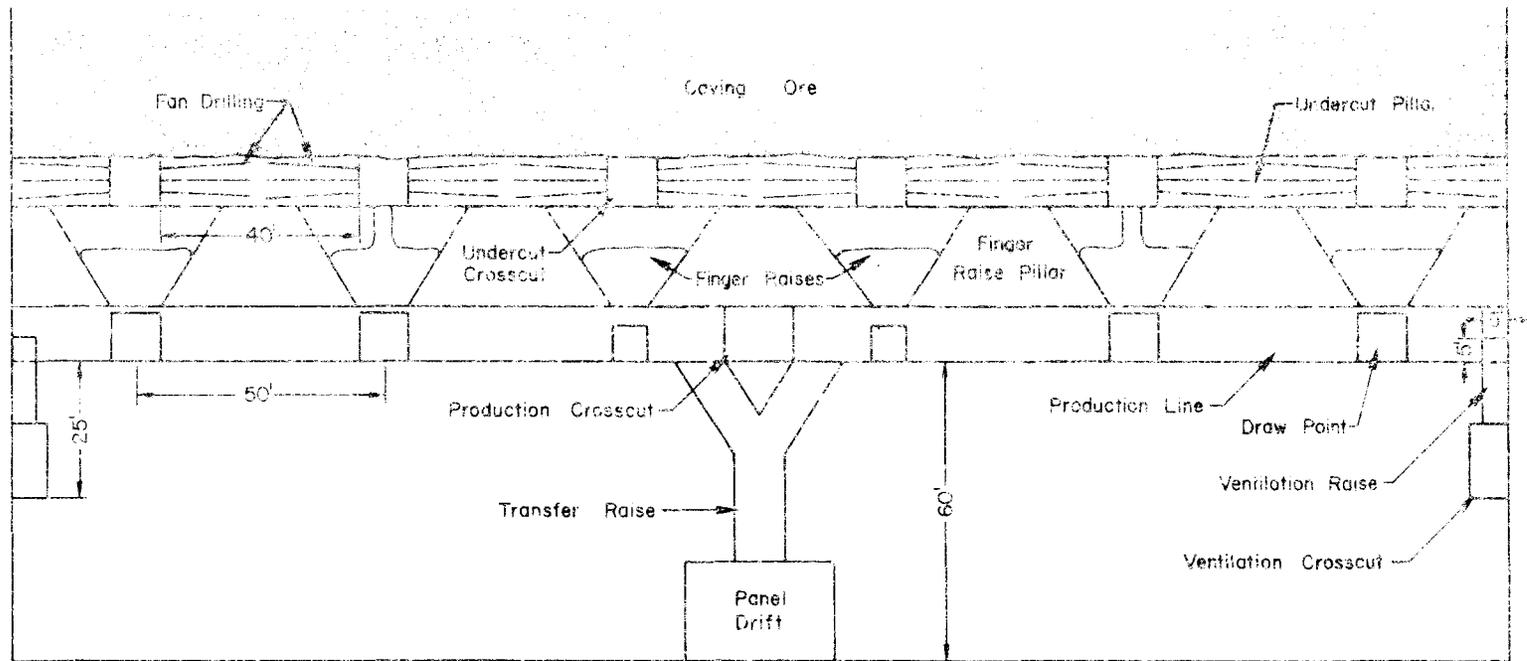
Vertical Section, Showing Panel Drift, Transfer Raise, Production Level and Undercut Level, Block Caving with LHD's
